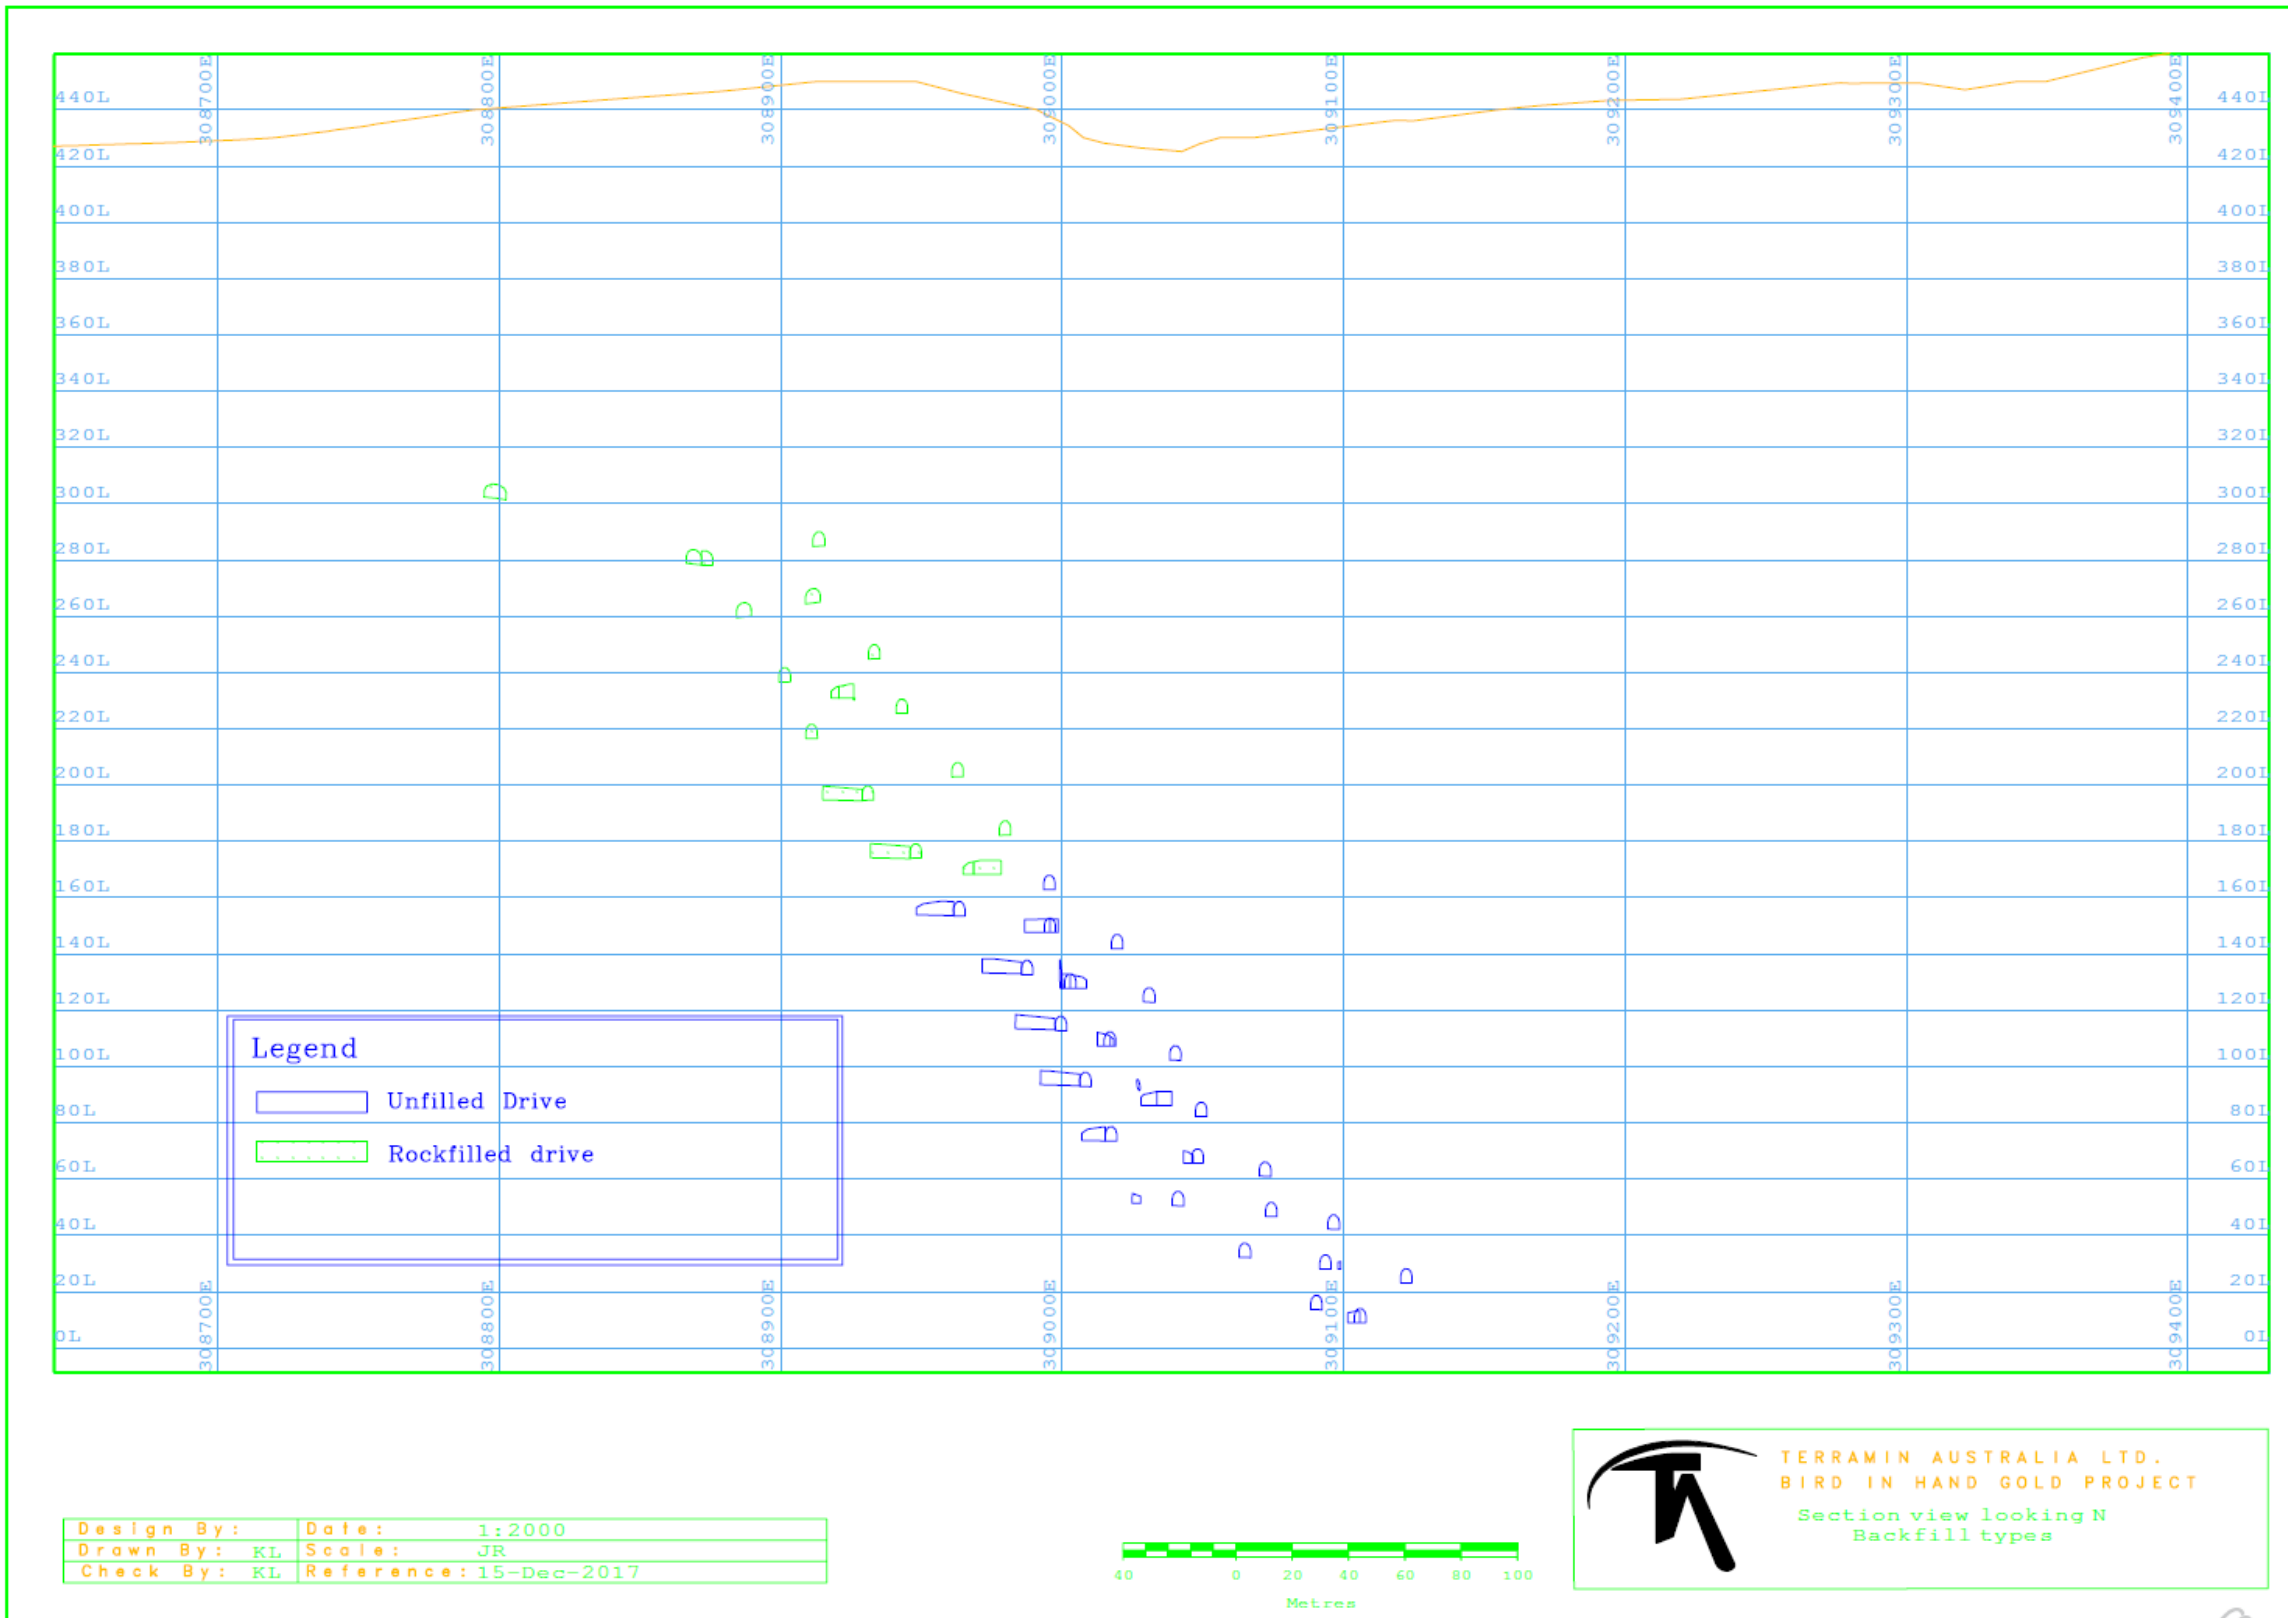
| CROSS SECTION THROUGH LOWER DECLINE LOOKING NE, SHOWING DRIVES PROPOSED TO BE FILLED
